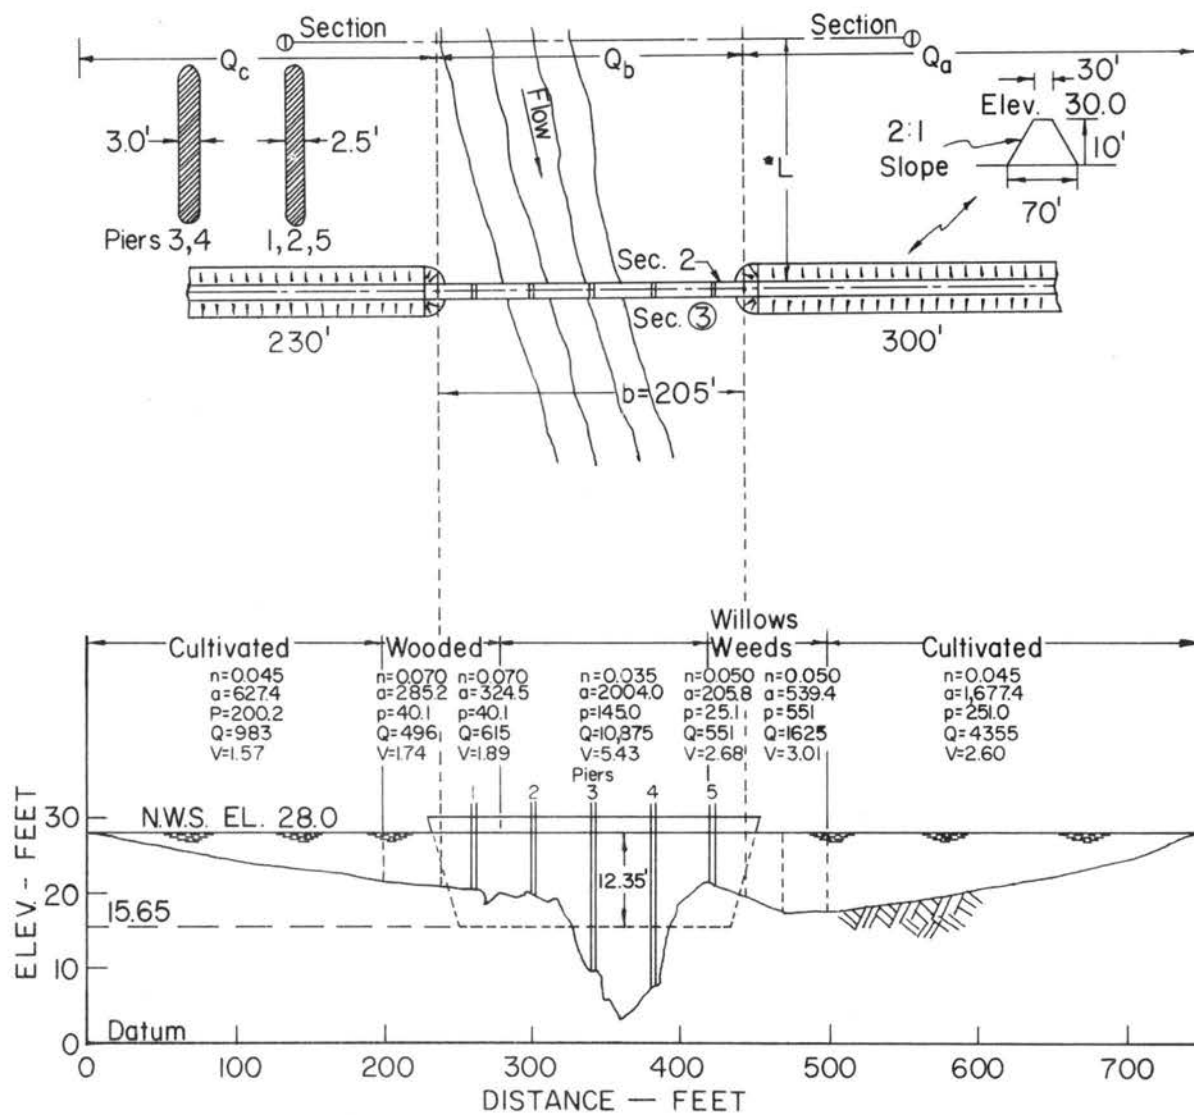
Plan and Cross Section of Example Crossing from Bradley (14)
